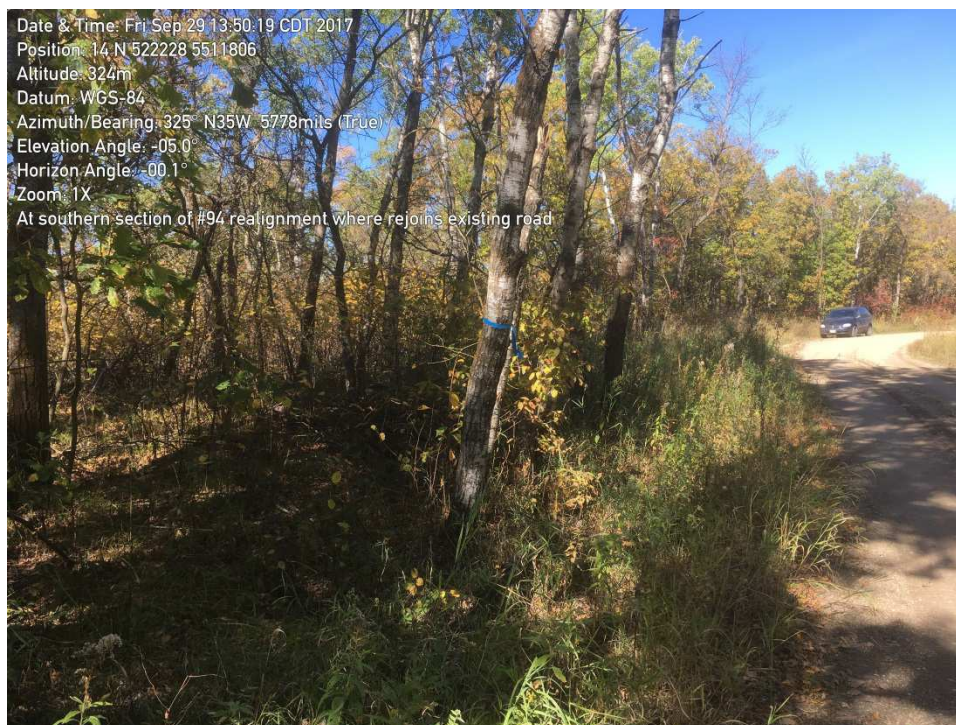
South side of proposed realignment at Site #94 (looking north).
